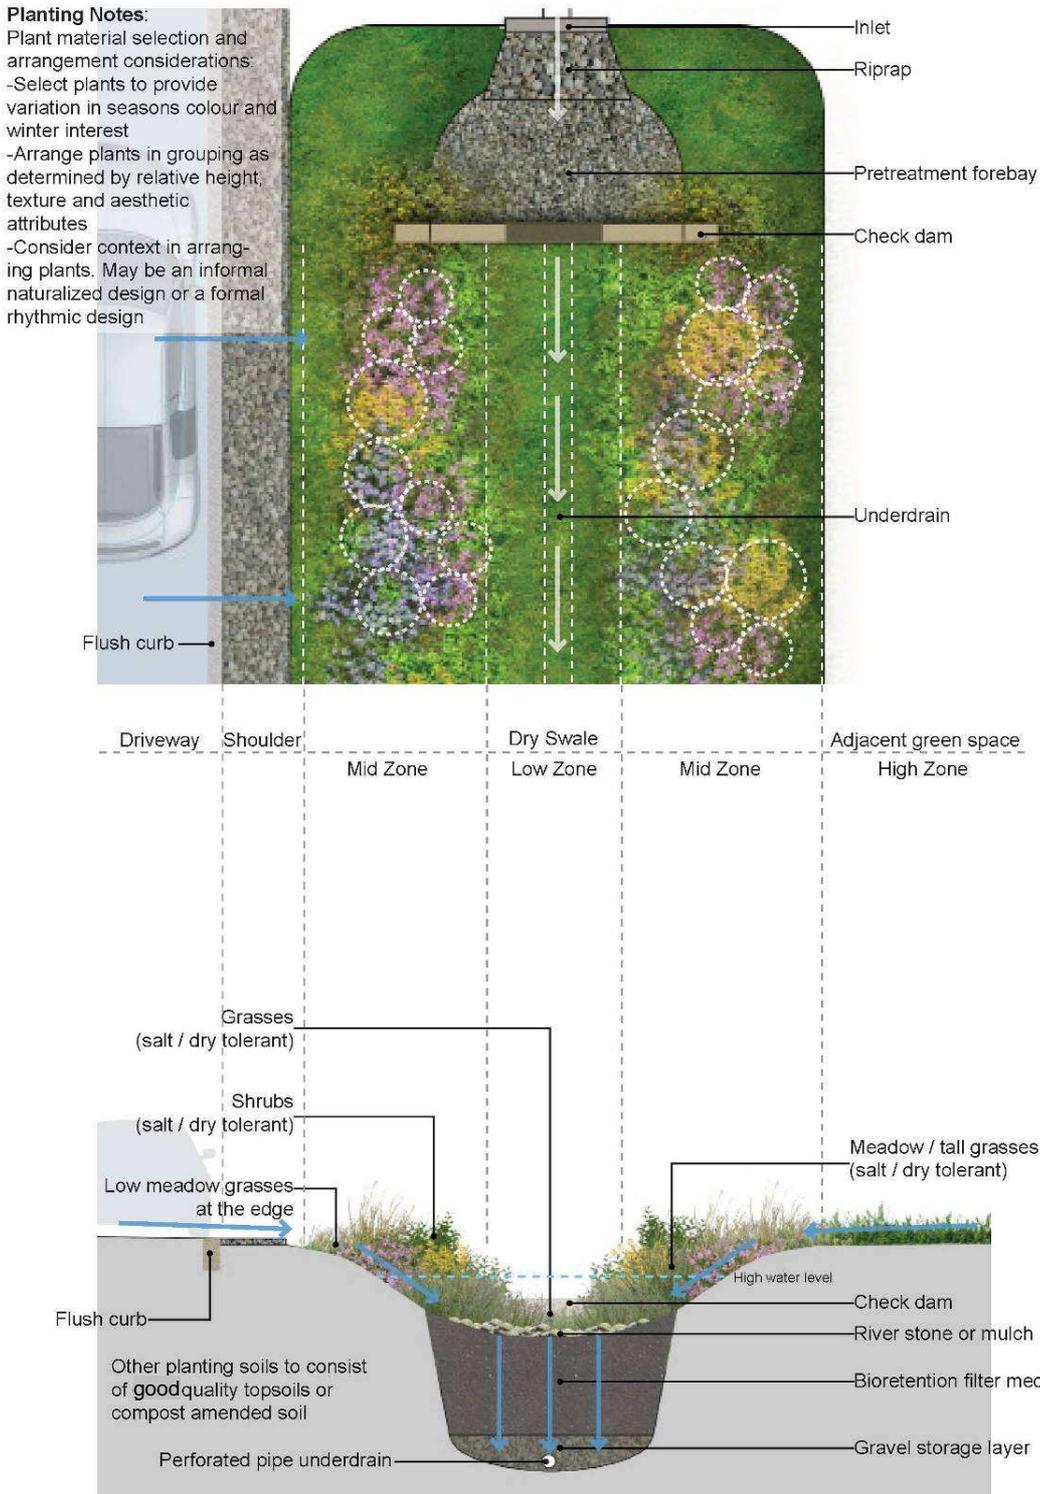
Dry swale plan view and cross-section; sizing and layout guidance is provided in the LID Stormwater Management Planning and Design Guide.
